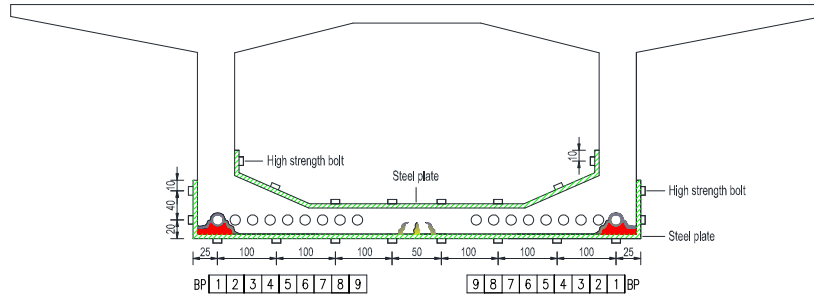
shows the seven basic steps applying the reinforcement of bonding steel plate as follows: relaxation of prestressed strands, closure of cracks, planting of bolts, bonding steel plate, repairing of bottom plate concrete and retension of the prestressed strands. The relaxation of the prestressed strands was symmetrically schemed from BP9 to BP1, as shown in Figure 14.
